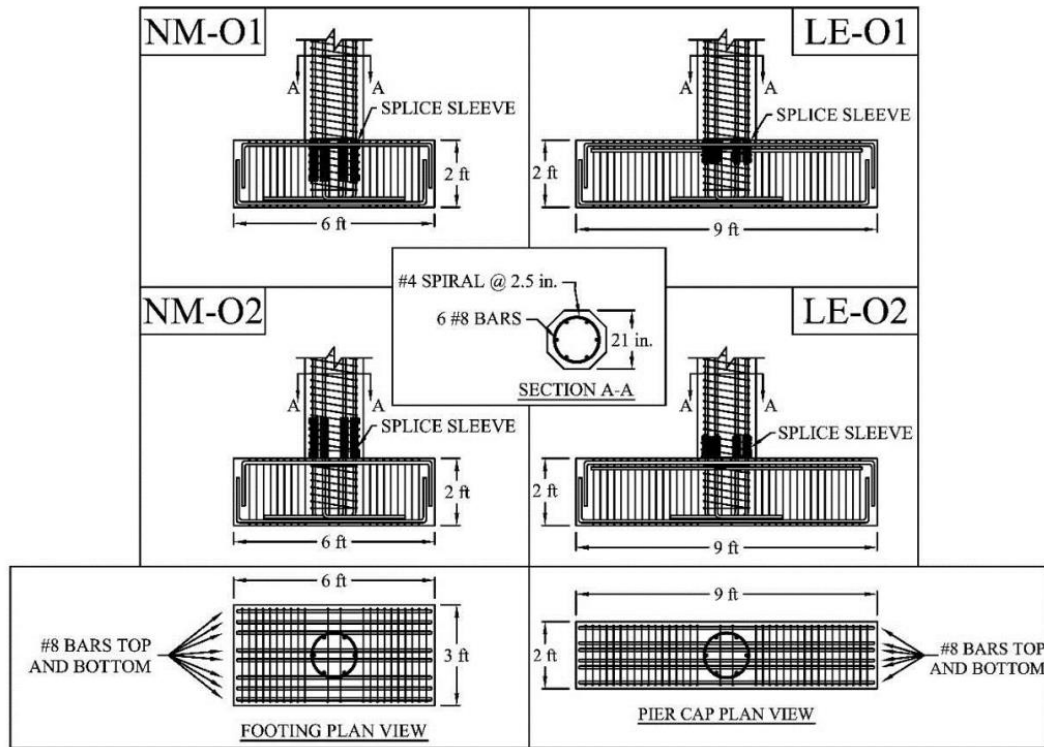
Original Specimen Reinforcement and Geometry. 1 ft = 304 mm; 1 in = 25.4 mm.
